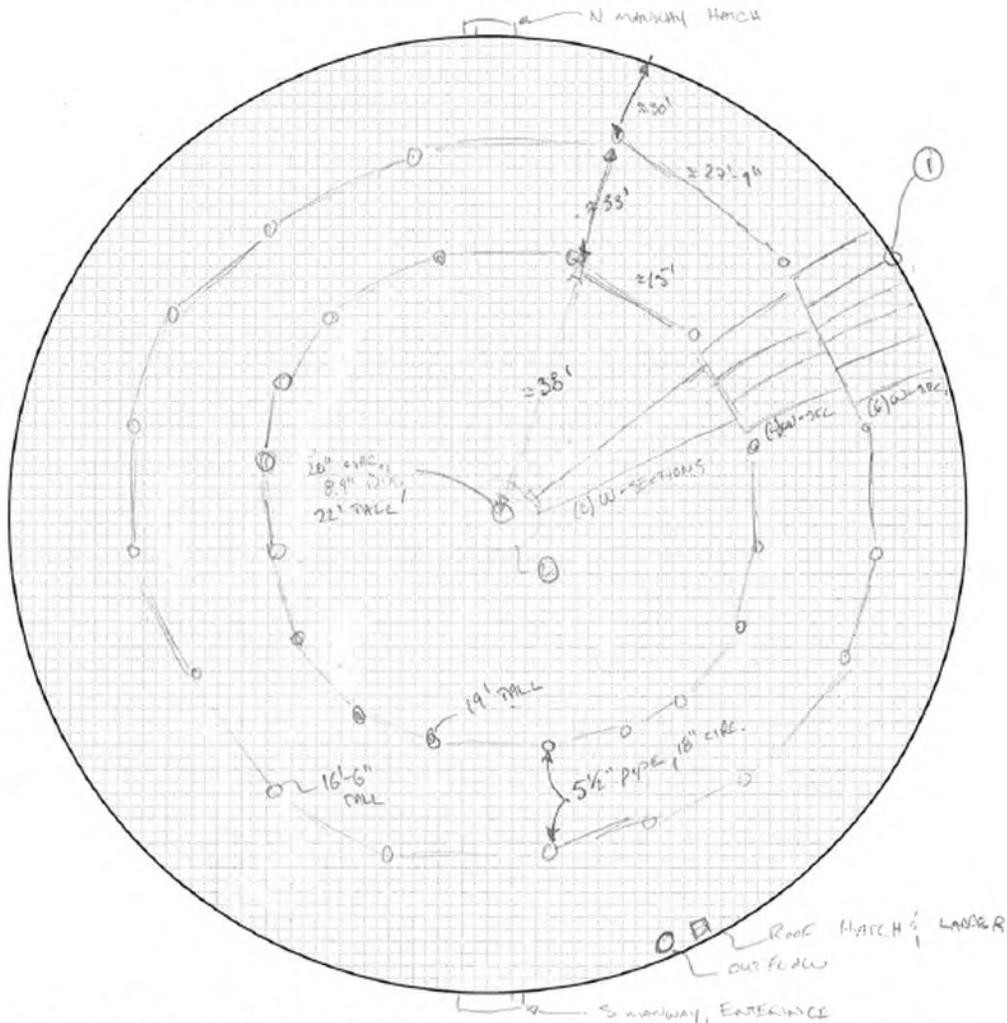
Reservoir REFLECTED ROOF AND RAFTER Plan – Sketch location of roof supports, hatches, vent, columns, etc. List given and measured diameters.
